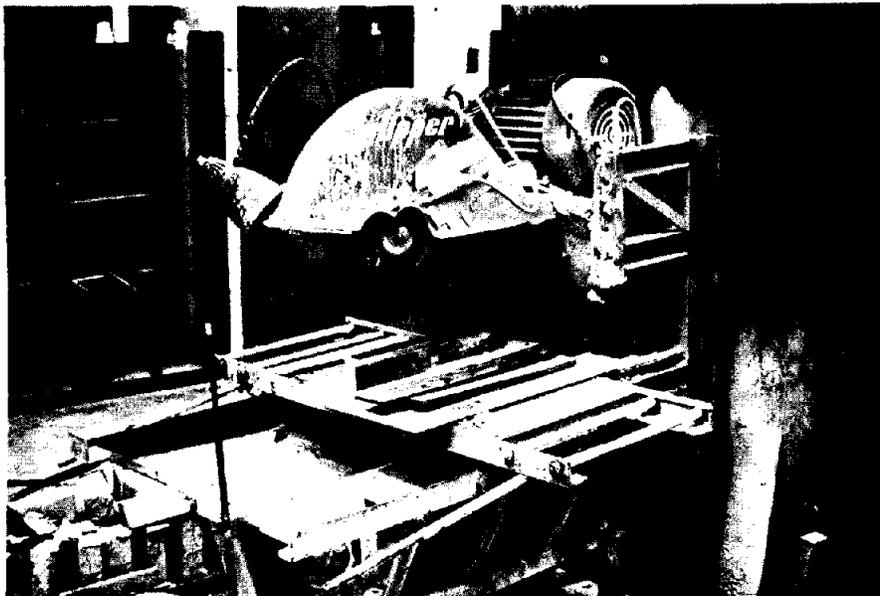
MASONRY SAW WITH CARRIAGE MODIFIED
